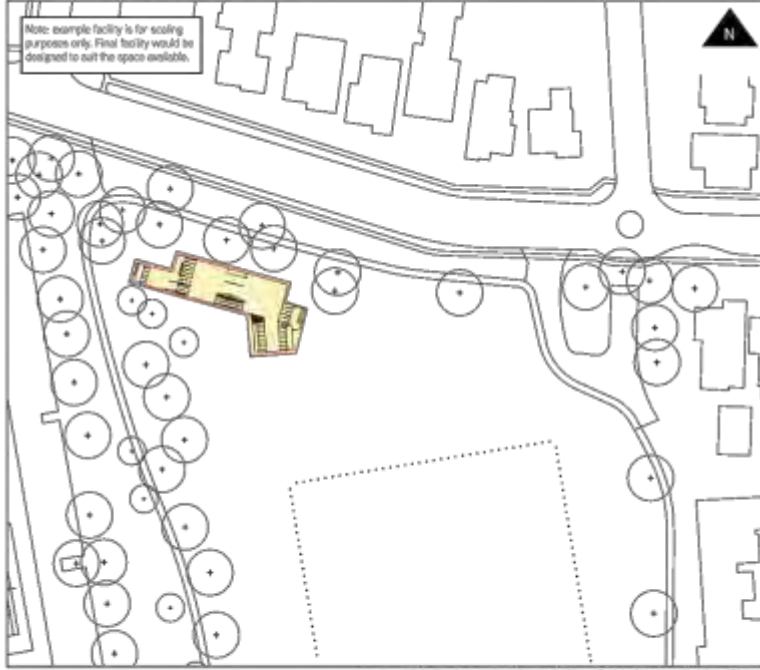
| Indicative overlay of local facility - Cedric Archer, WA (size 431sqm)
